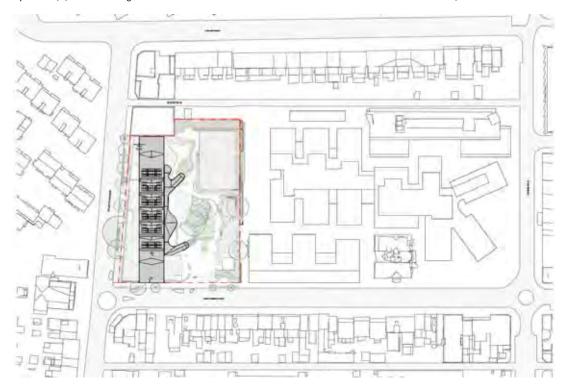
Site plan. (Source: FJMT, April 2020)
